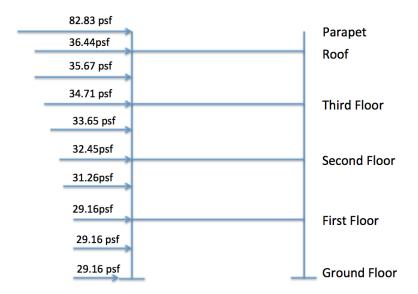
Wind Load Distribution per Floor (East-West Direction)
